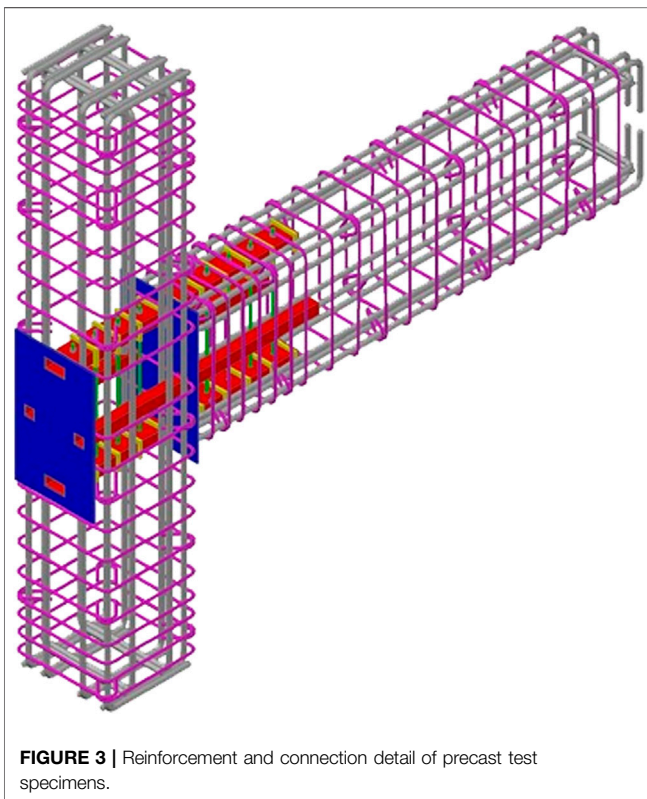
| Reinforcement and connection detail of precast test specimens.
